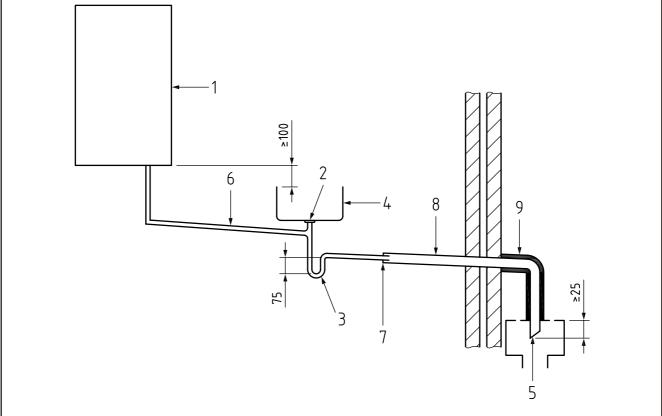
Connection of a condensate drainage pipe downstream of a sink, basin, bath or shower waste trap
